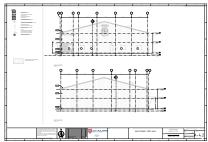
21 A-4.2-BUILDING ELEVATIONS
